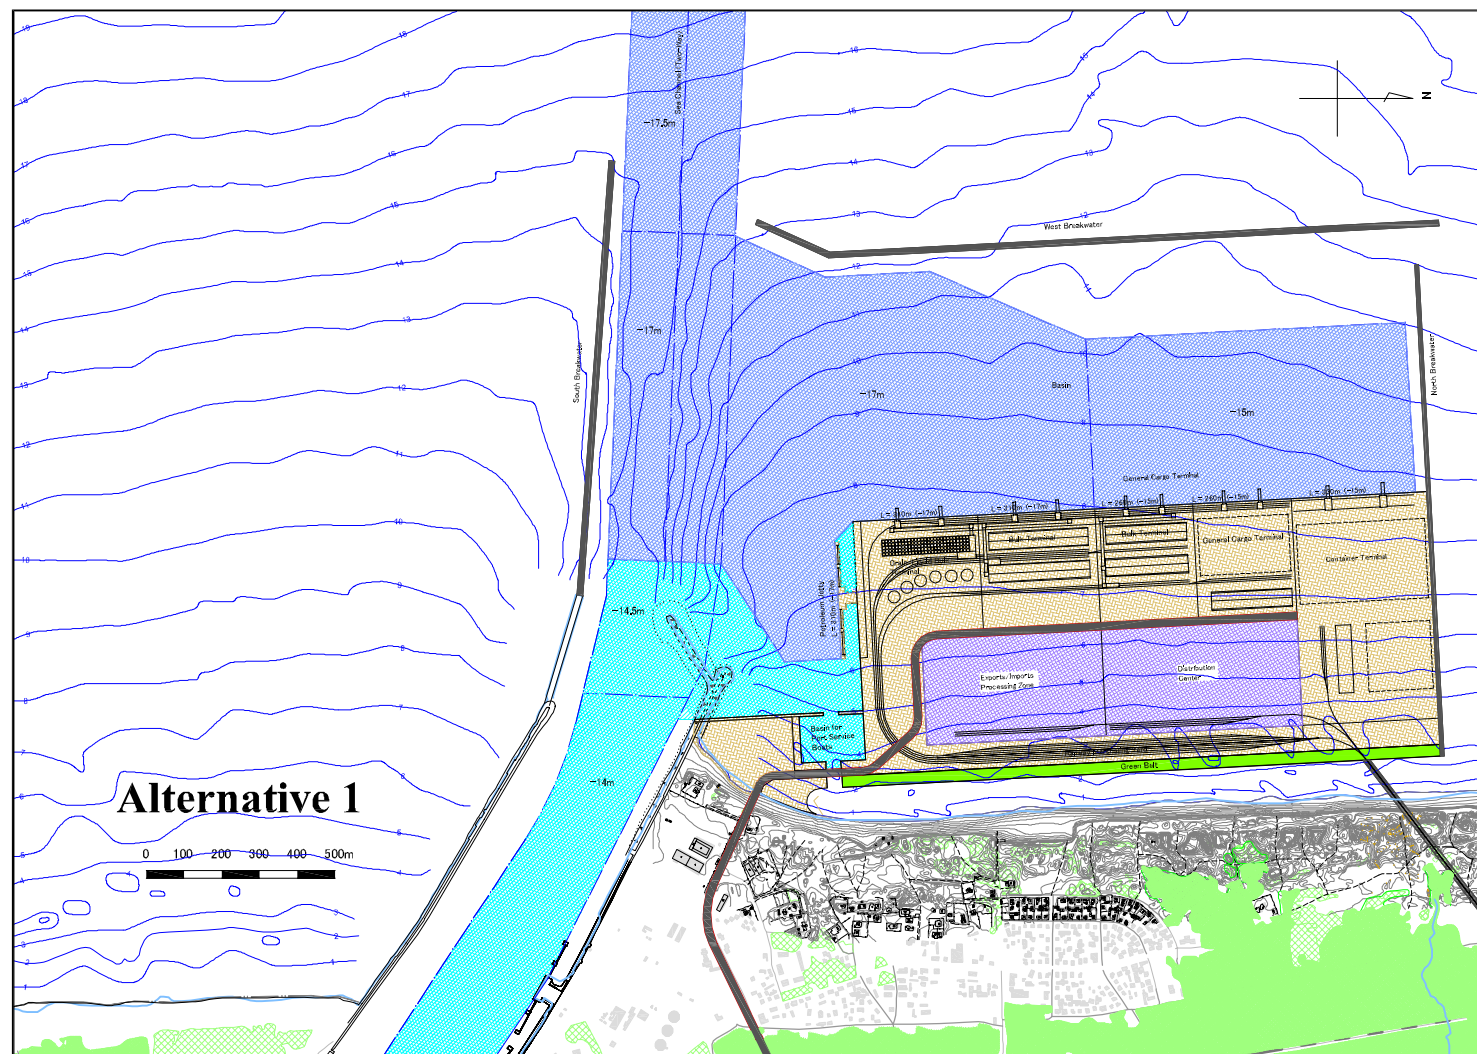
Facility Layout Plan of Outer Port (Alternative 1-4)
